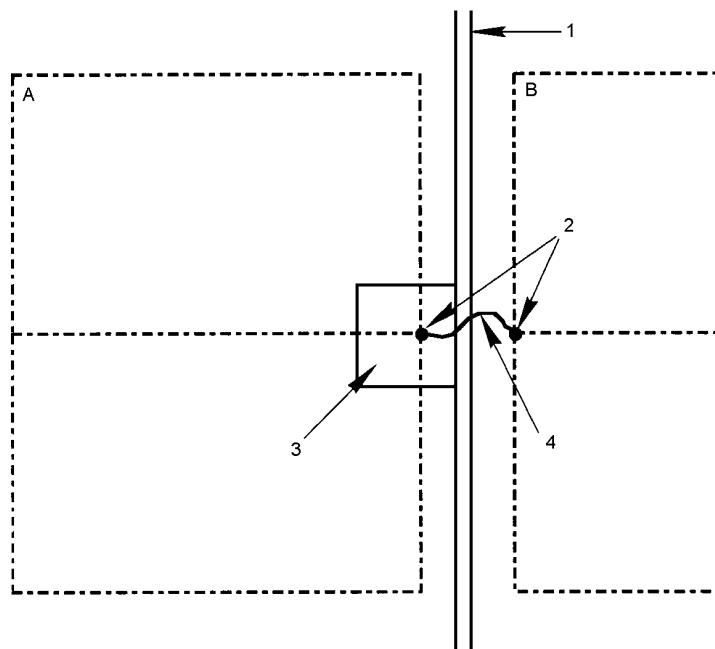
Construction of the steel bonding bar connections to the equipotentialization bars in a steel-reinforced structure where the reinforcement is used as a natural component of the LPS
